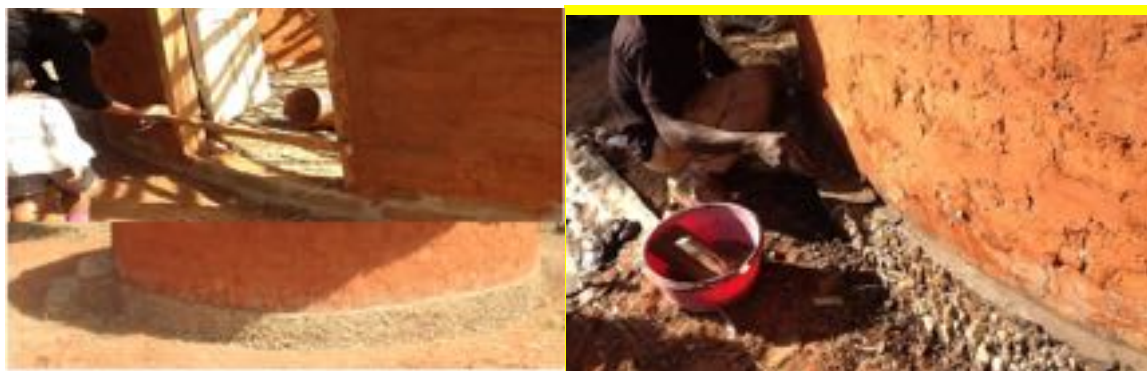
Concrete foundation walls to reduce seepage, (source: author's photograph, 2015).
